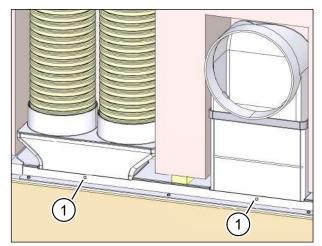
Fixing the connections for flat ductwork / flexible pipe to the wall box
